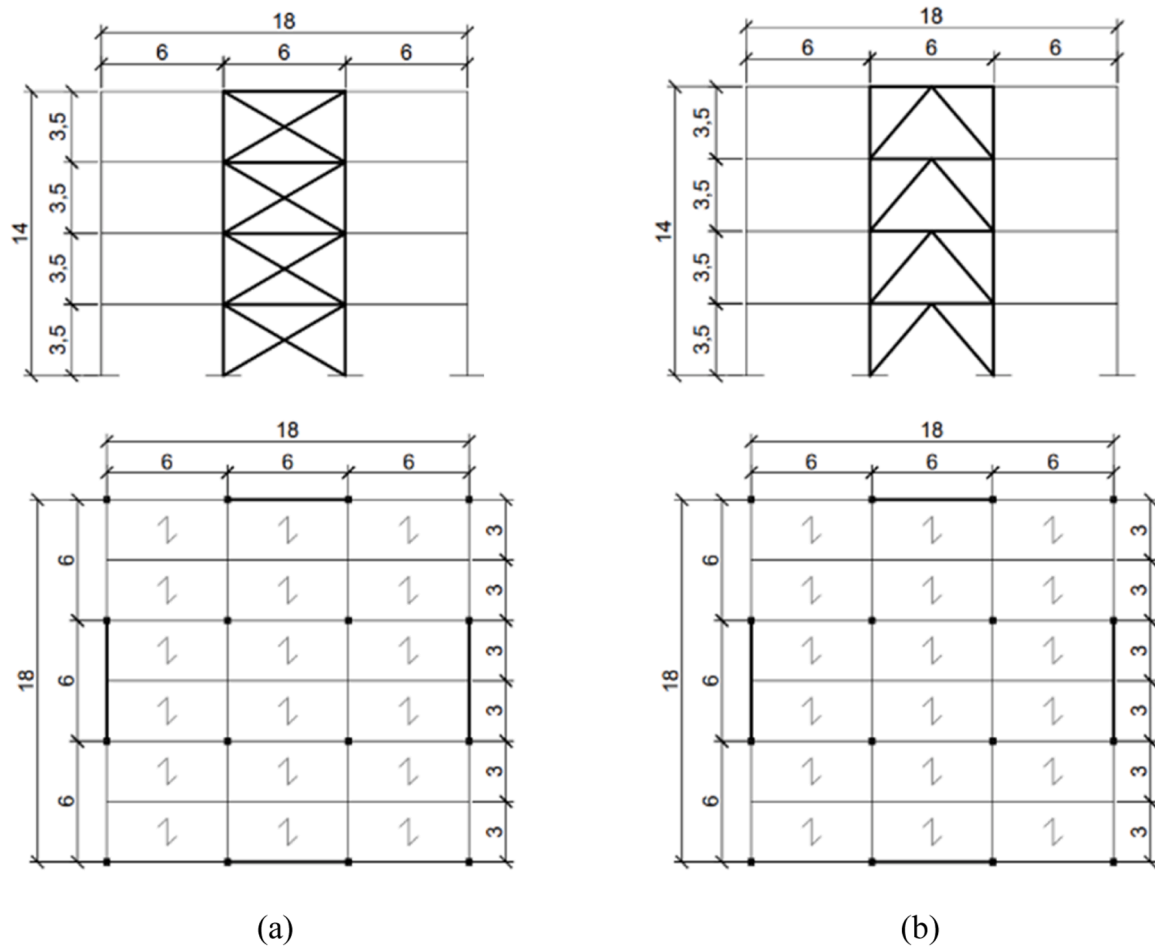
Structural configuration (side and top views) for the examined (a) STR1 and (b) STR2 buildings.
